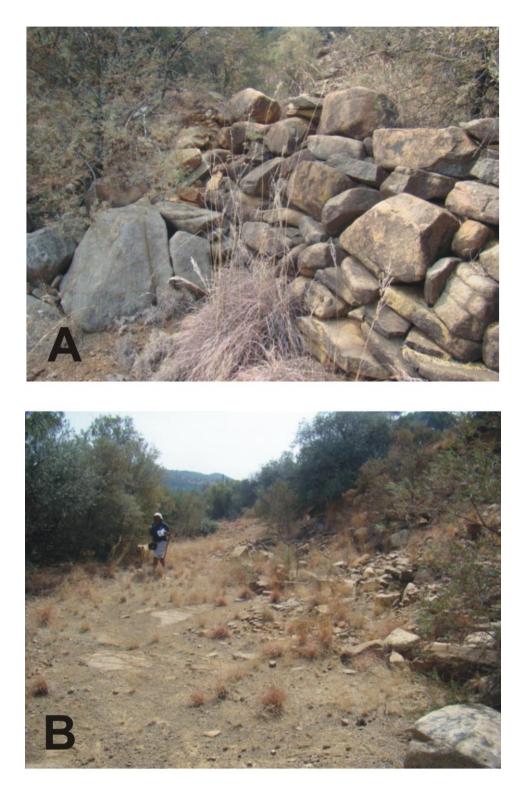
Remains of sections of dolerite cobble foundation and support (A) for an old road construction (B).
